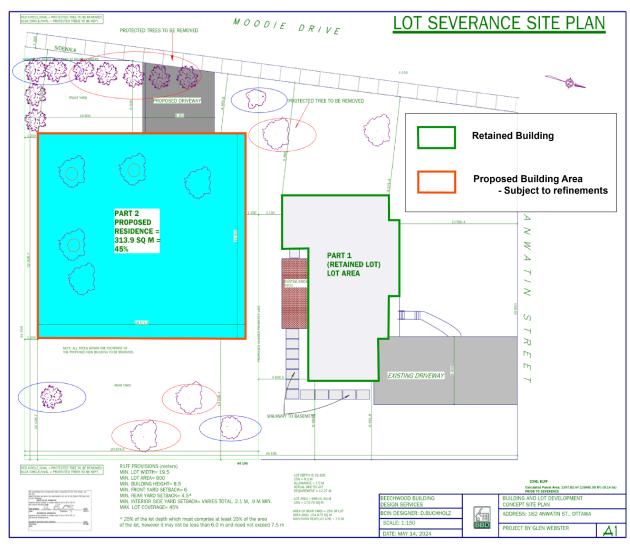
Coloured Site Plan (Source: Beechwood Building Design Services. & marked up by Q9)
